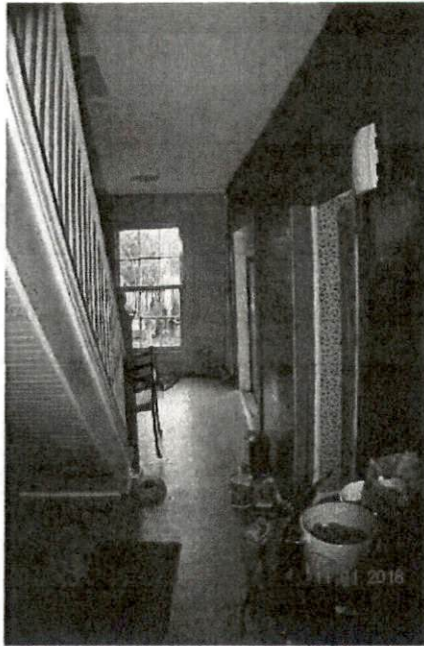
There is a load bearing wall between the hallway and kitchen. The floor is framed differently on each side of this wall. The hallway side (to the right in this photo) of the rear wall is pushed out a bit.
